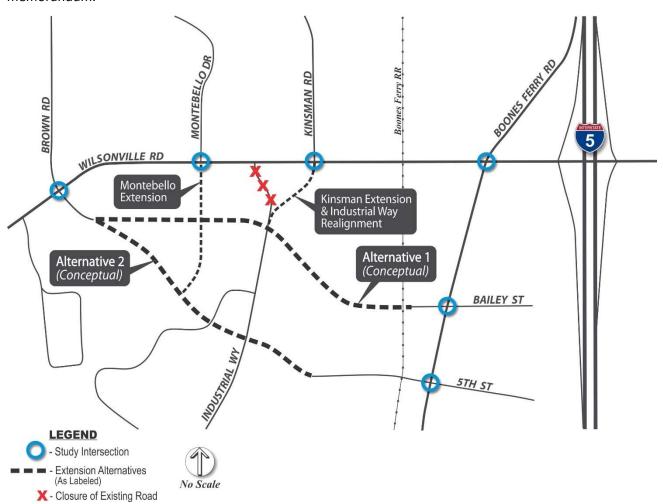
Boones Ferry Road to Brown Road Connector Alignment Alternatives Conceptual Drawing
